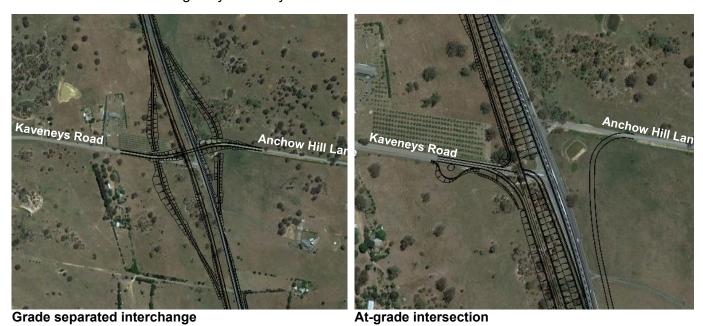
Intersection design options at Kaveneys Road – Anchow Hill Lane intersection
